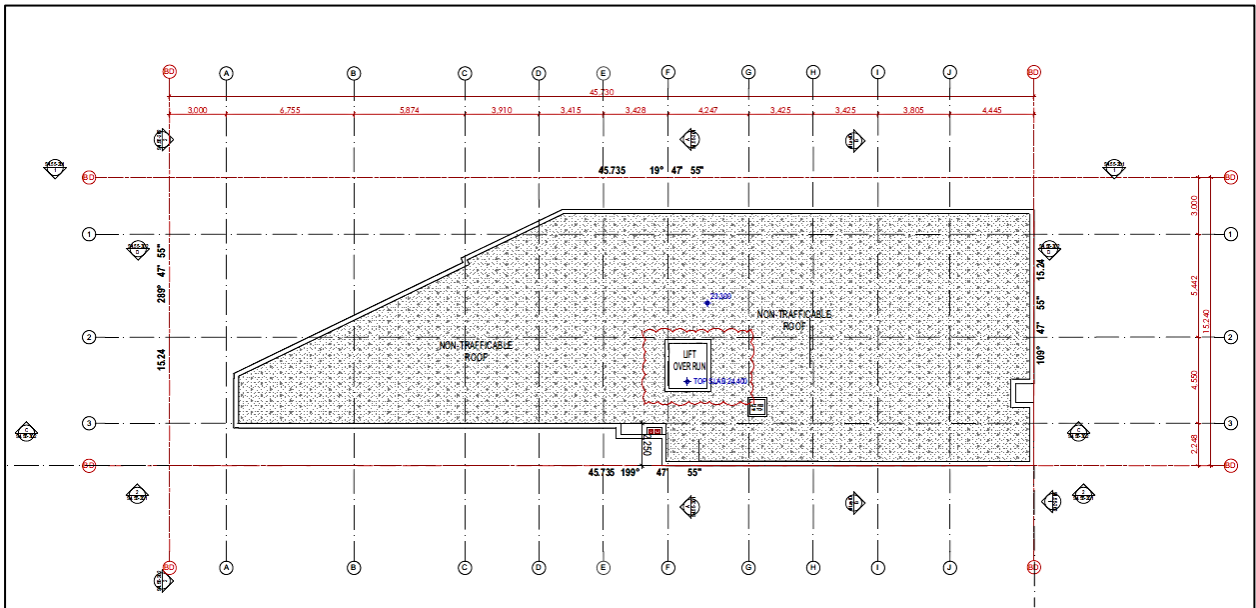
Proposed Modified Roof Plan – DA 2018/67/4
